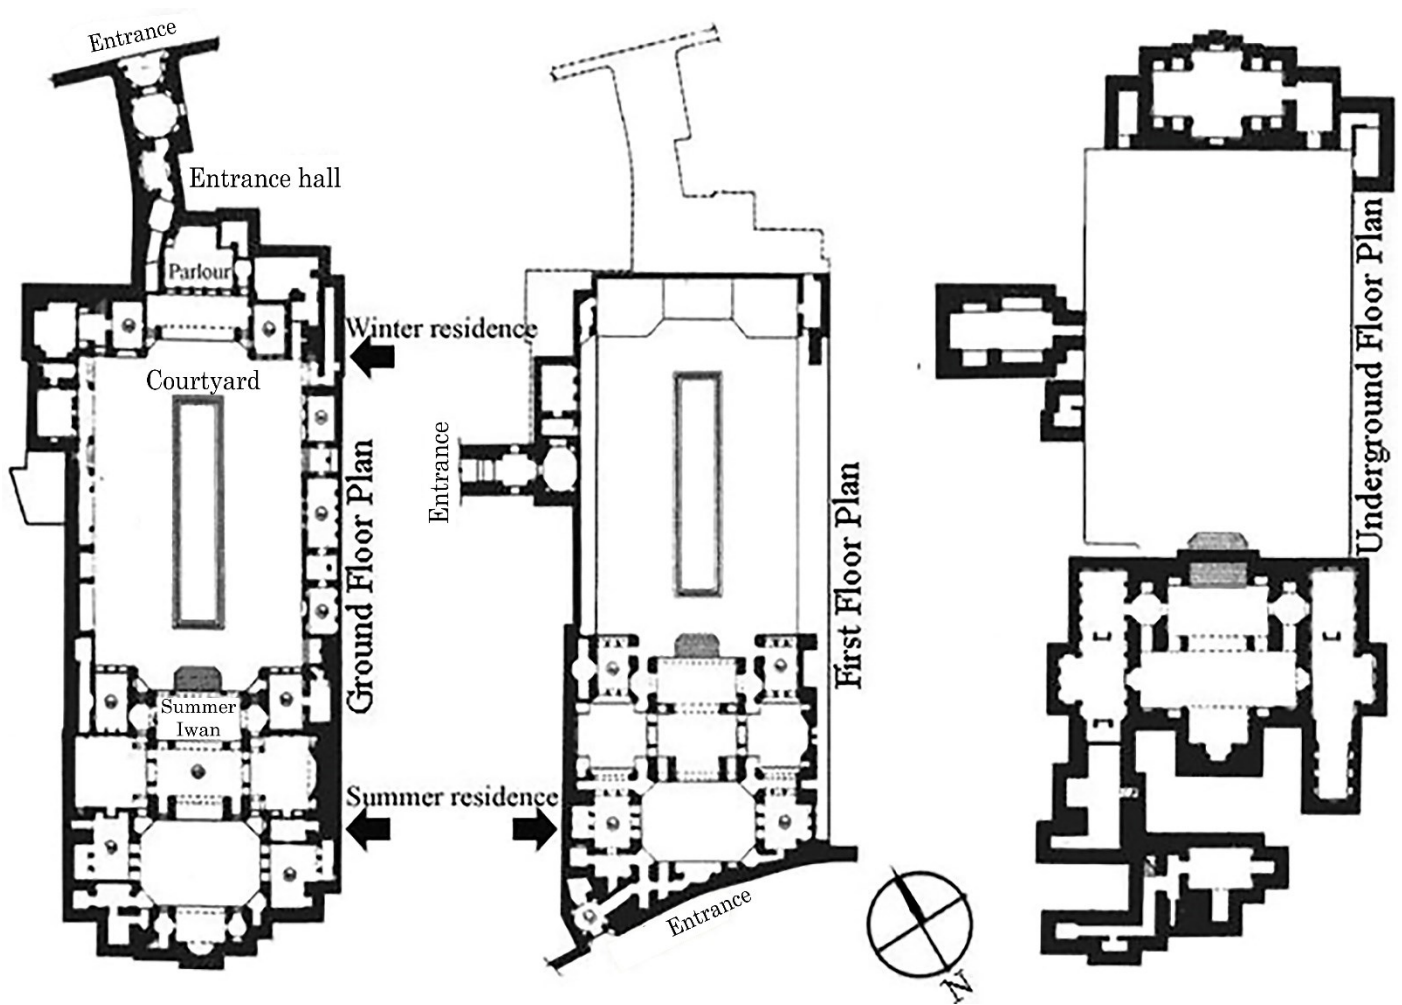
Borujerdi House, the ground floor, first floor, and underground floor layouts, Kashan, Iran. (Source: Nosratpour, 2012)
